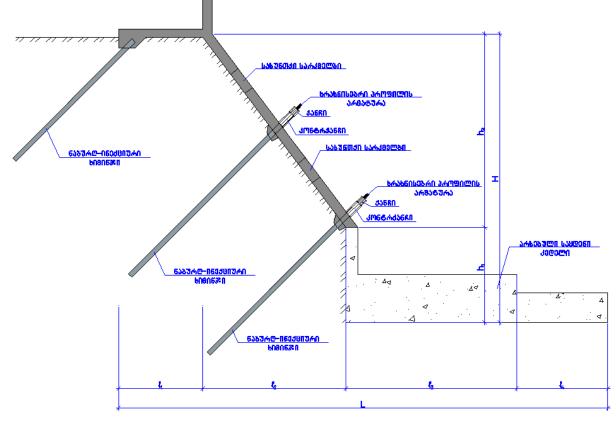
Cross section of thin-walled retaining walls pressed against the terrain
